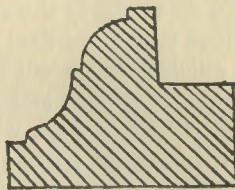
A CONVENTIONAL STRAIGHT-EDGE MOULDING
